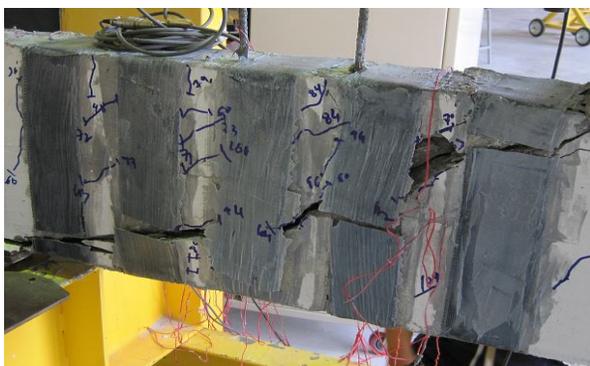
Cracking and failure pattern of beam C2.5-UA-V2
